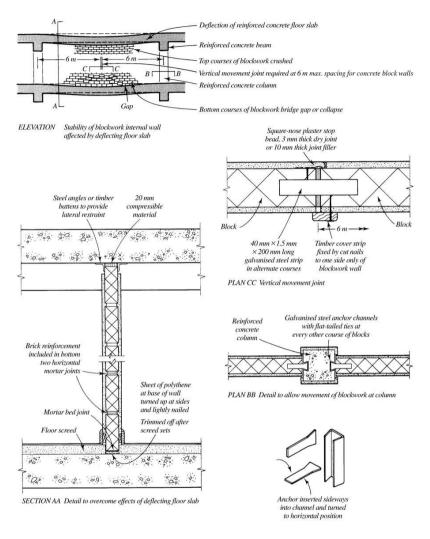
Deflection of reinforced concrete beams and the stability of non-load-bearing blockwork internal wall.
